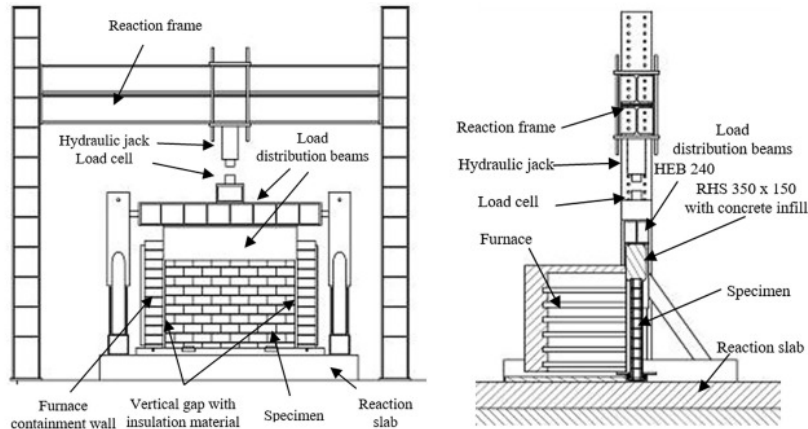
Wallettes testing set-up by Lopes et al. [55,56]
